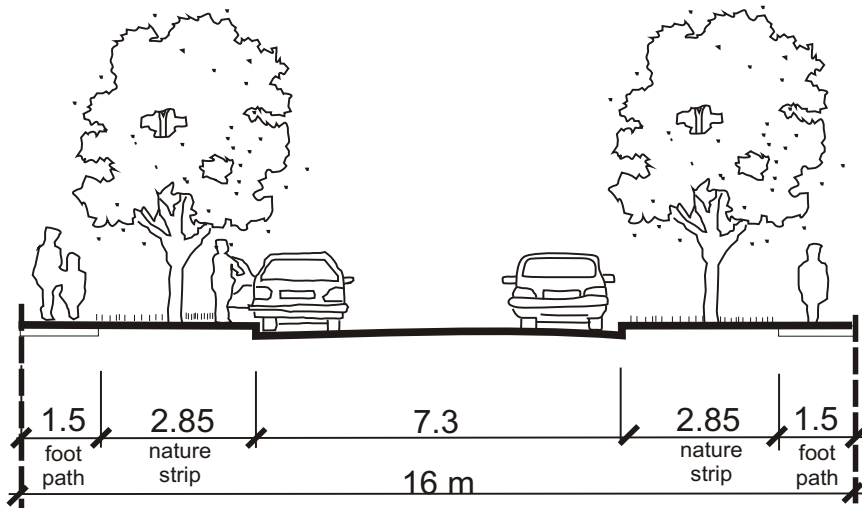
FIGURE N: SERVICE ROAD TO 4C RING ROAD
